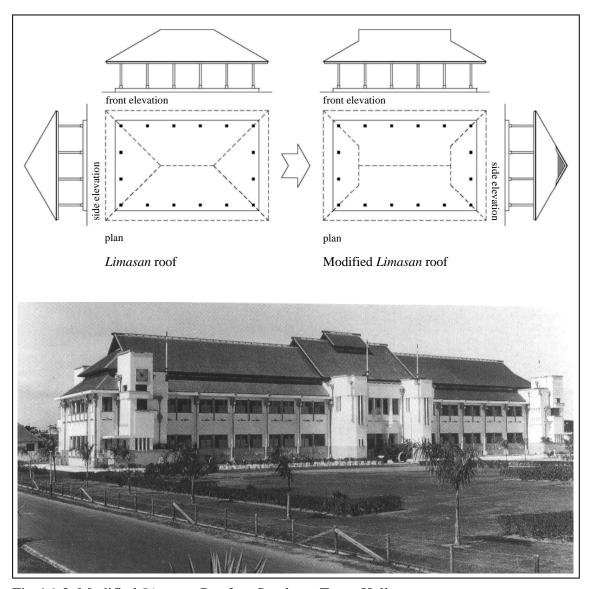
Modified *Limasan* Roof on Surabaya Town Hall.
